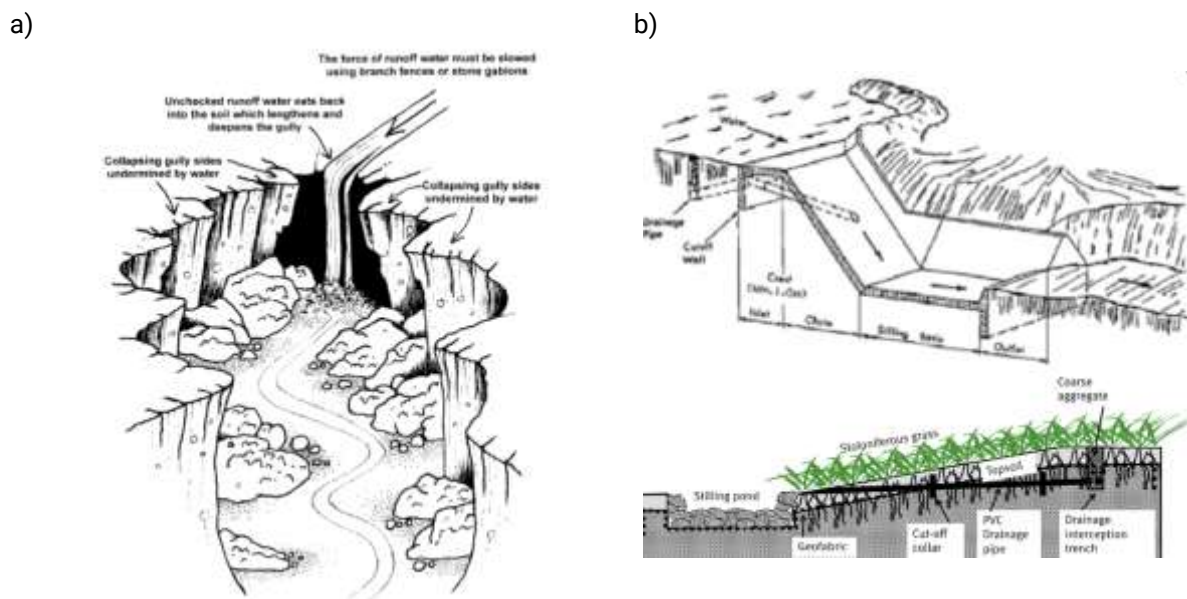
a) Example of a gully head cut showing the recommended location for installing a rock stilling basin,⁵⁶ and b) Cross-section views showing the components of a typical chute,⁵⁷ as the one observed in Site B.
